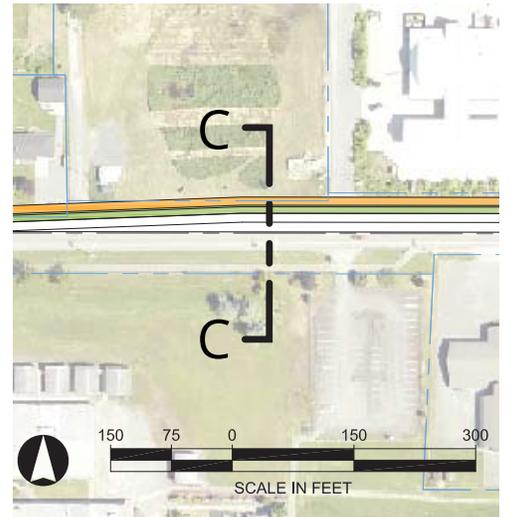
Proposed 172nd Street NE plan between 16th Drive NE and 11th Ave NE.
